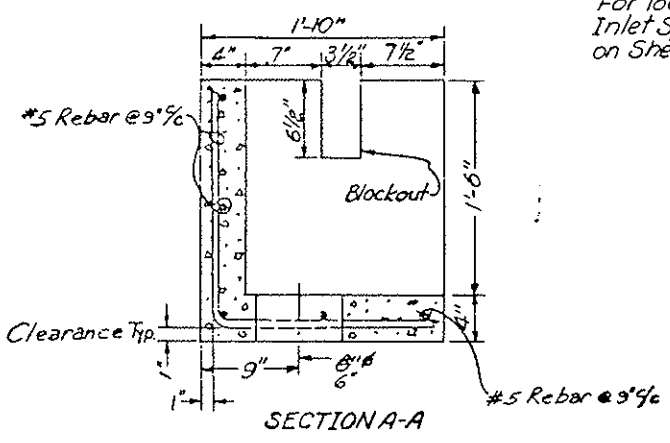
DETAILS OF PRECAST INLET SPECIAL, TYPE "S" & "T"
